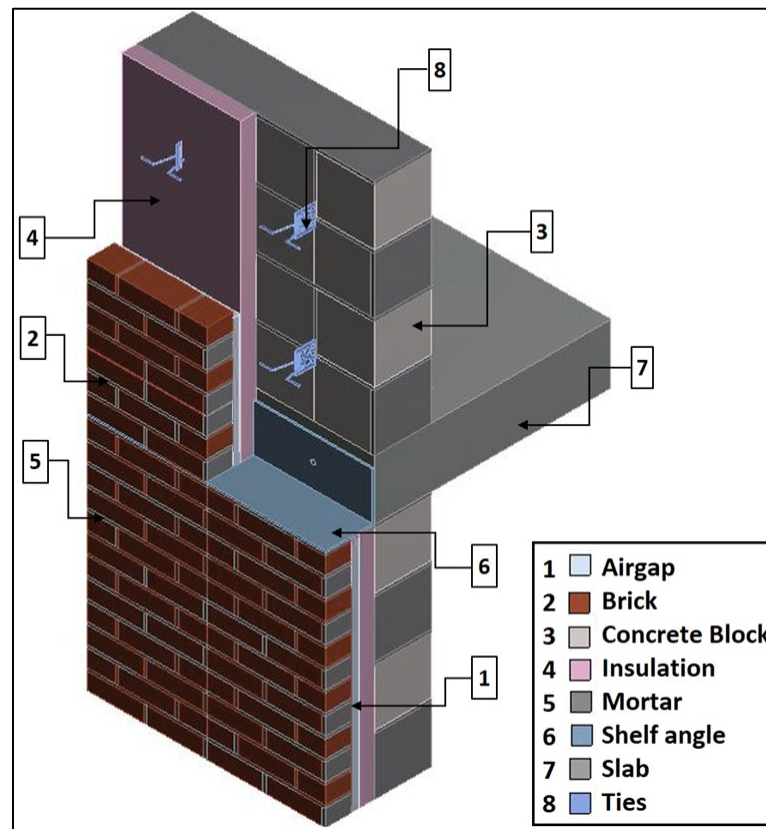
Components of masonry cavity walls with intermediate slab intersection
